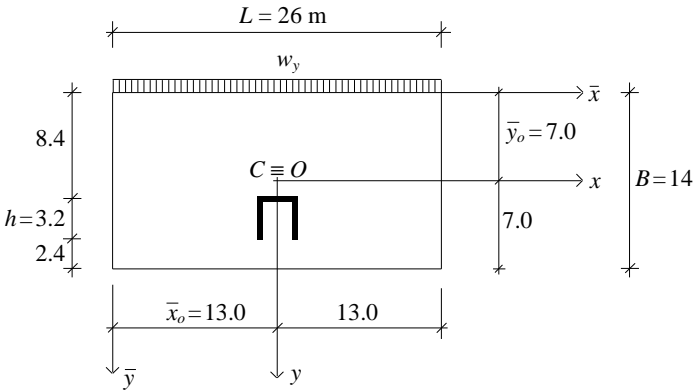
Kollár's building. Layout B: bracing core in the centre.
